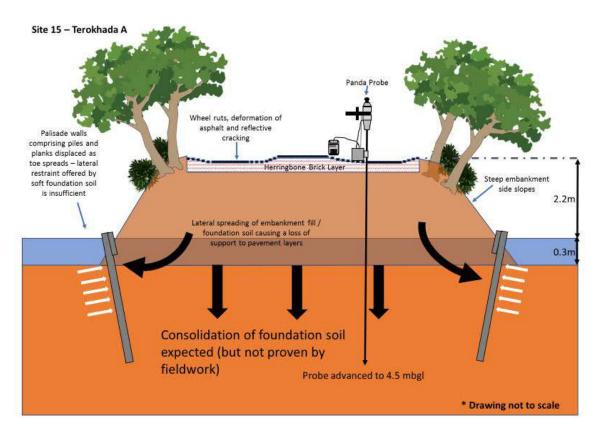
Site 15 – Terokhada A Observational Ground Model
